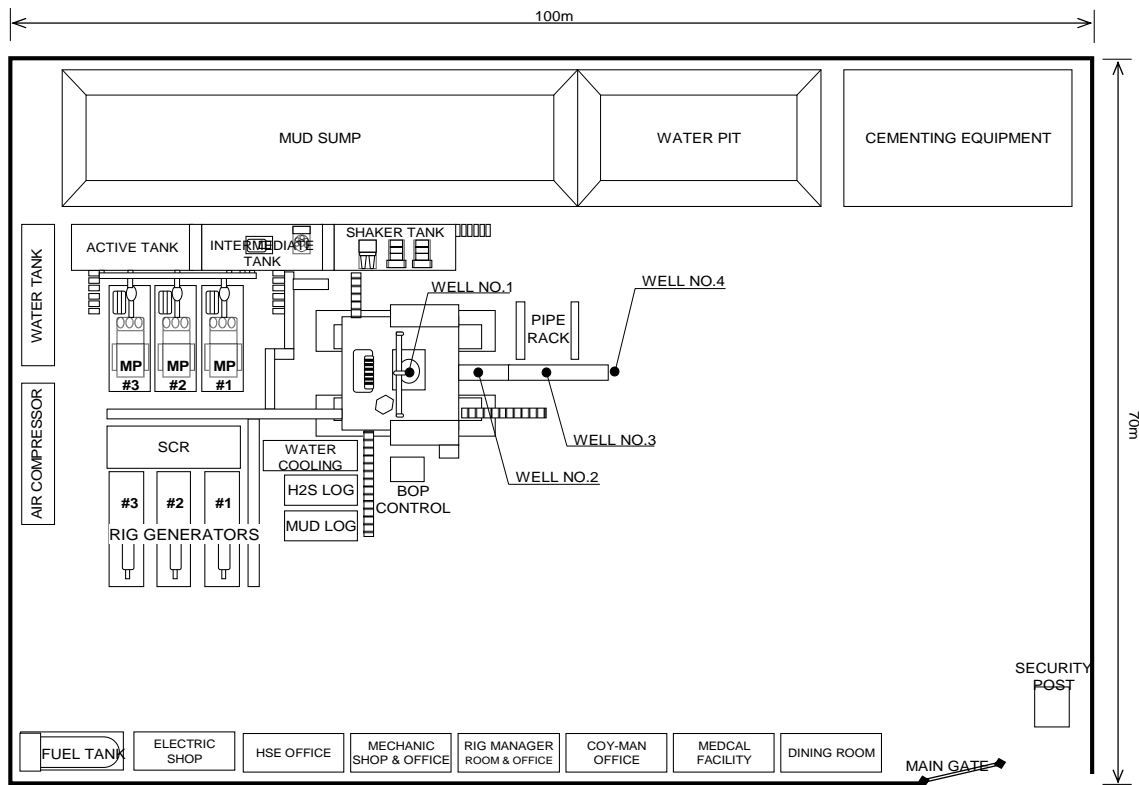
Typical Rig Layout (Not to Scale)
